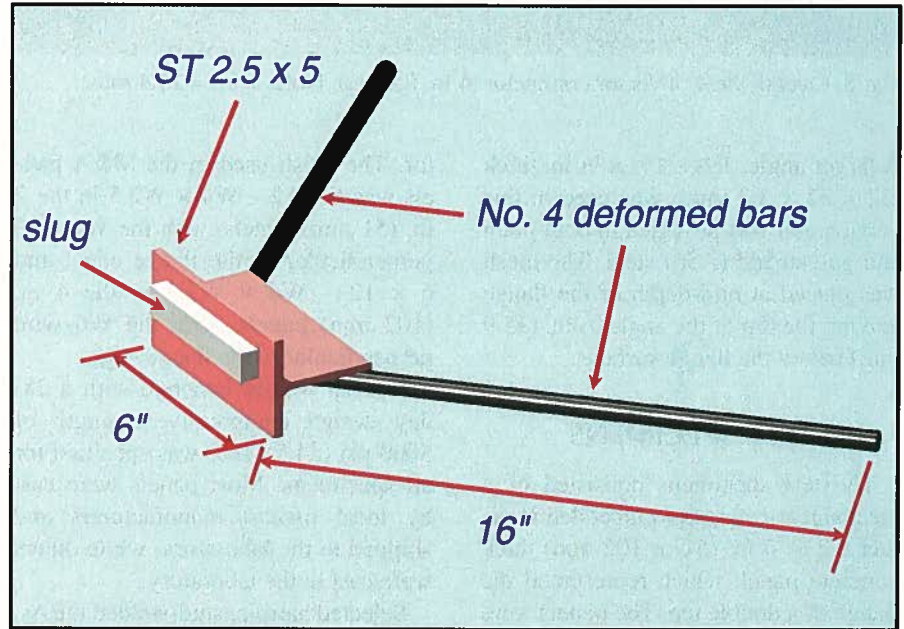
Details and dimensions of the structural tee connector (4 in. flanges). Note: 1 in. = 25.4 mm.
